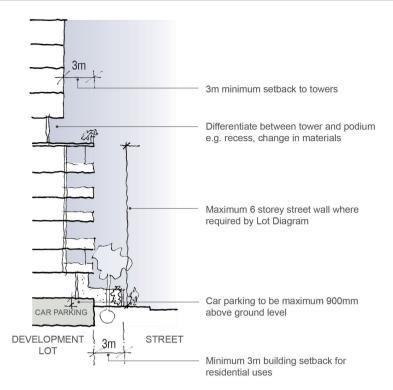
Typical Street wall heights and tower setbacks
